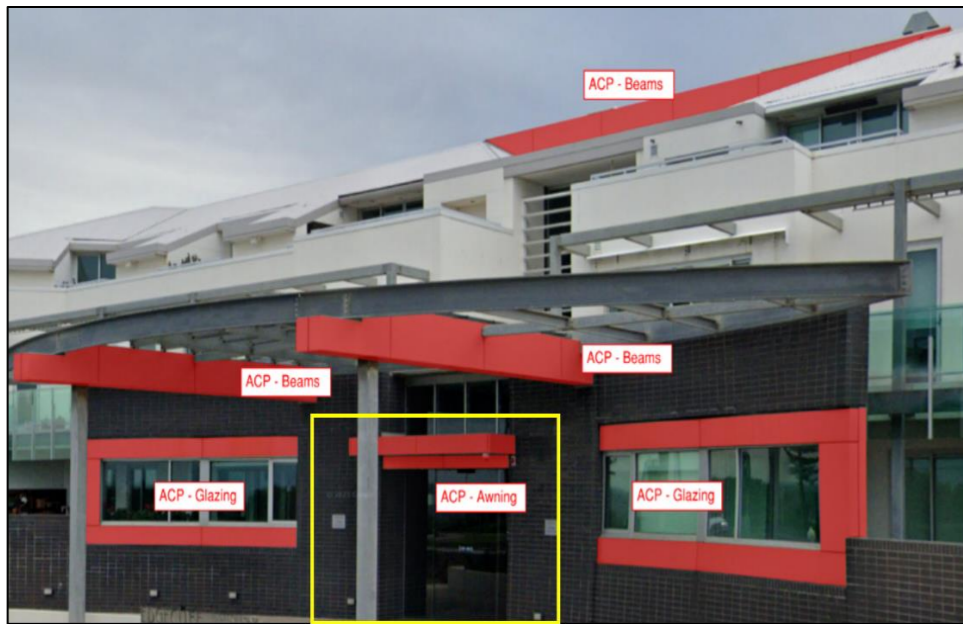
ACP cladding above and to either side of the exit. No sprinkler protection to SOU or exit.
